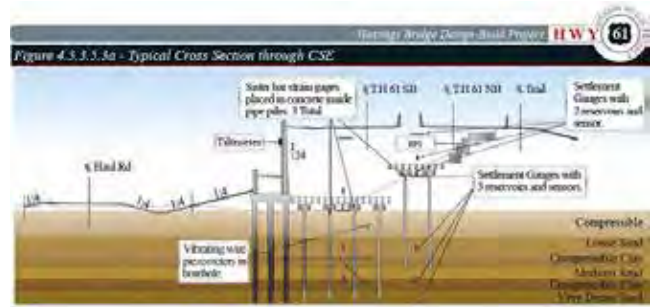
Cross-section of the Hastings Bridge column-supported embankment. (Behnke and Ames 2010).
